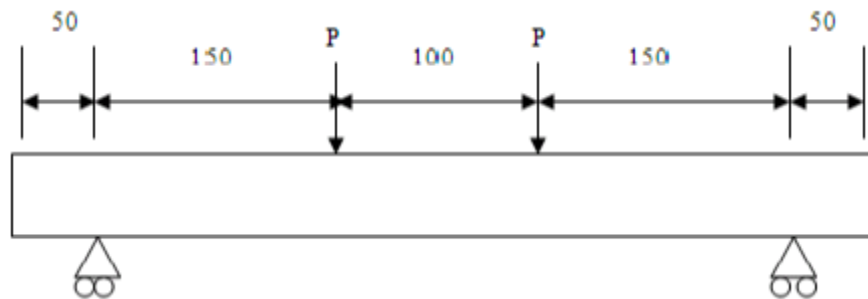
Two-point loading test arrangement. (Adapted from: [49])
